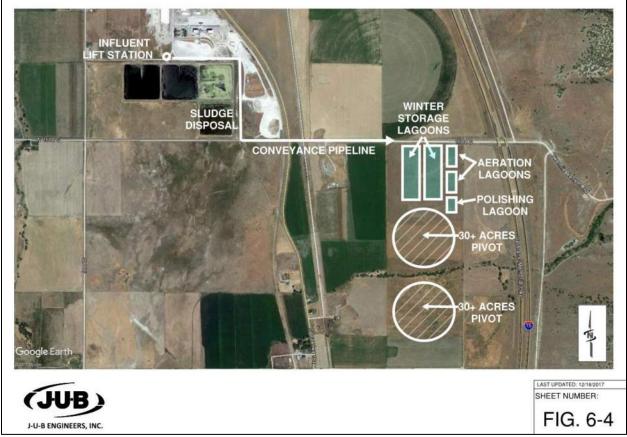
Conceptual Layout for Alternative 5B (exact site location to be determined)
